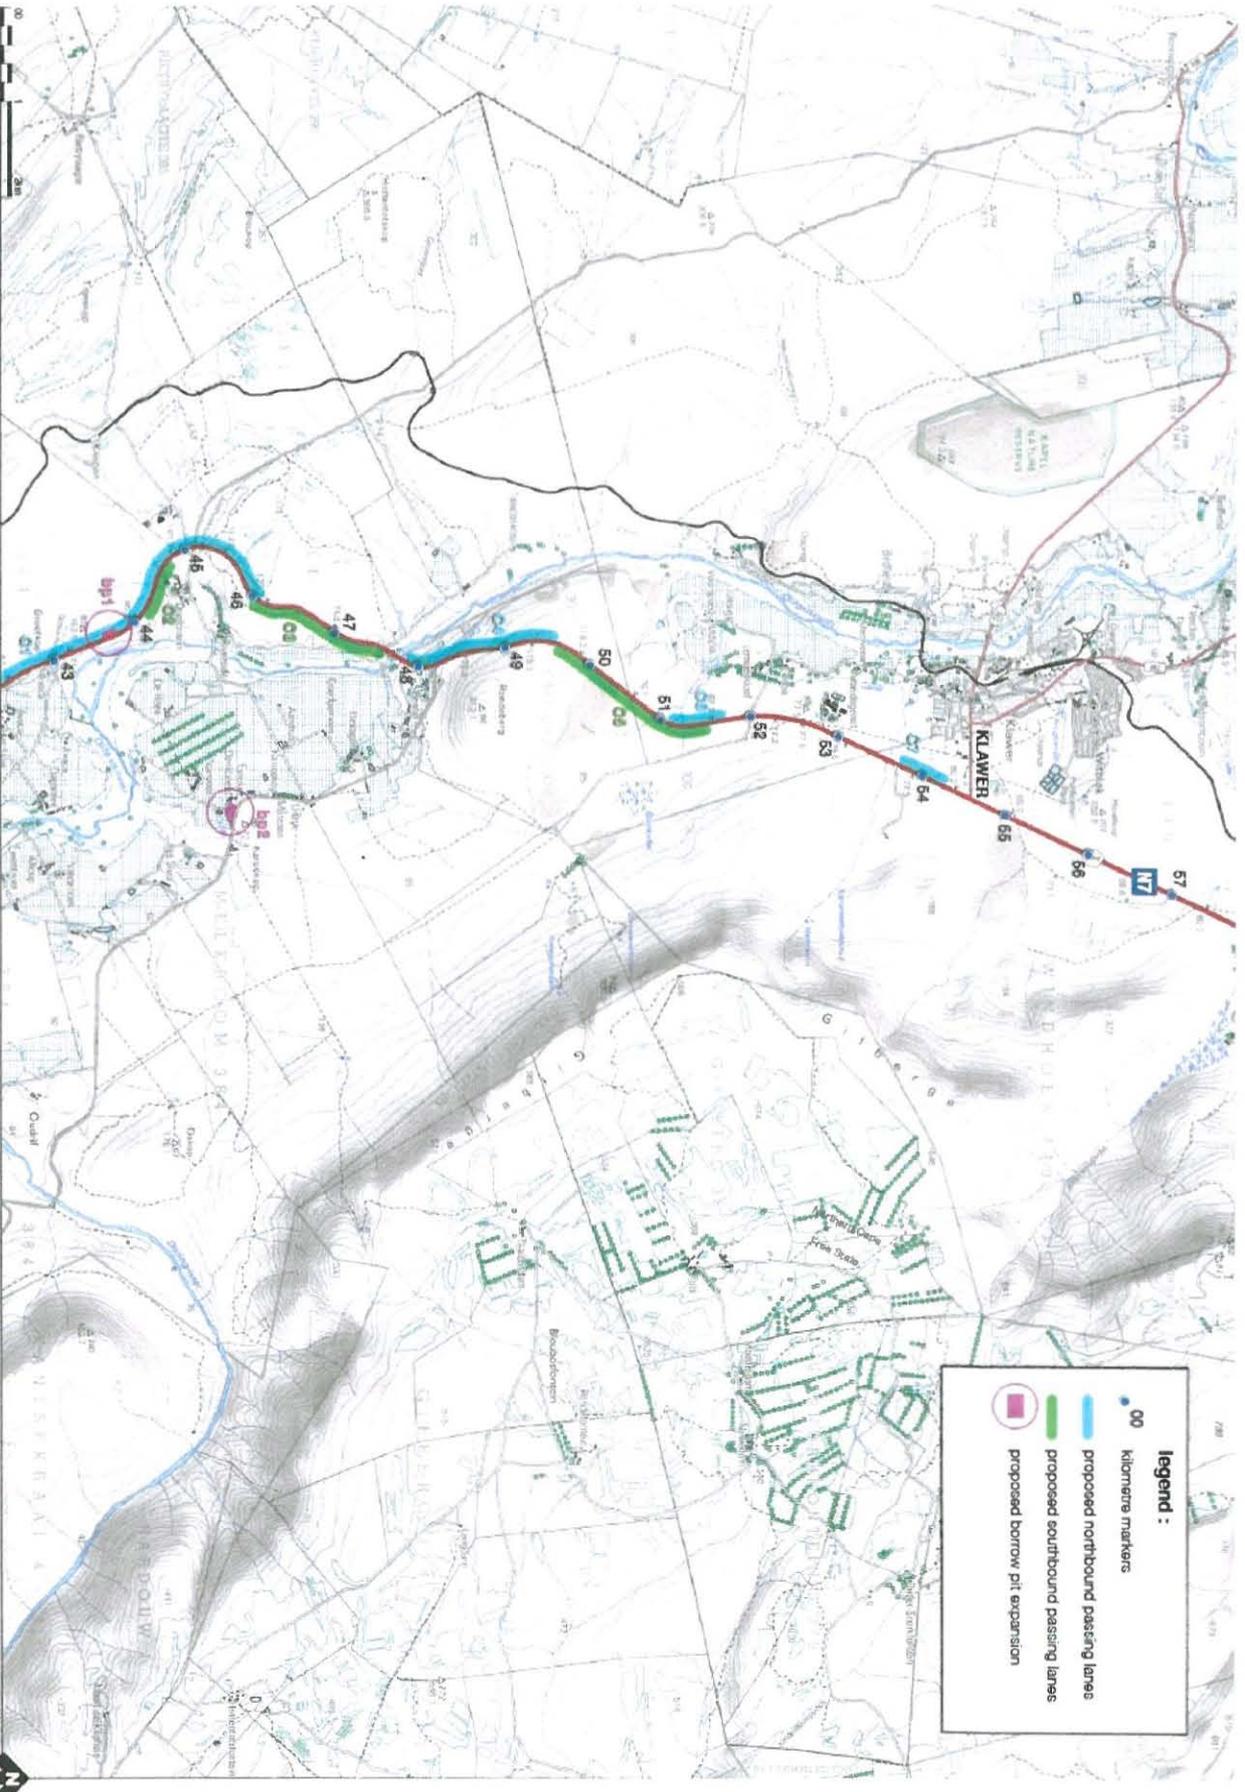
N7 Section 4 Upgrade - Proposed Passing Lanes (Trawal to Windhoekdooi - 42 to 58km)
